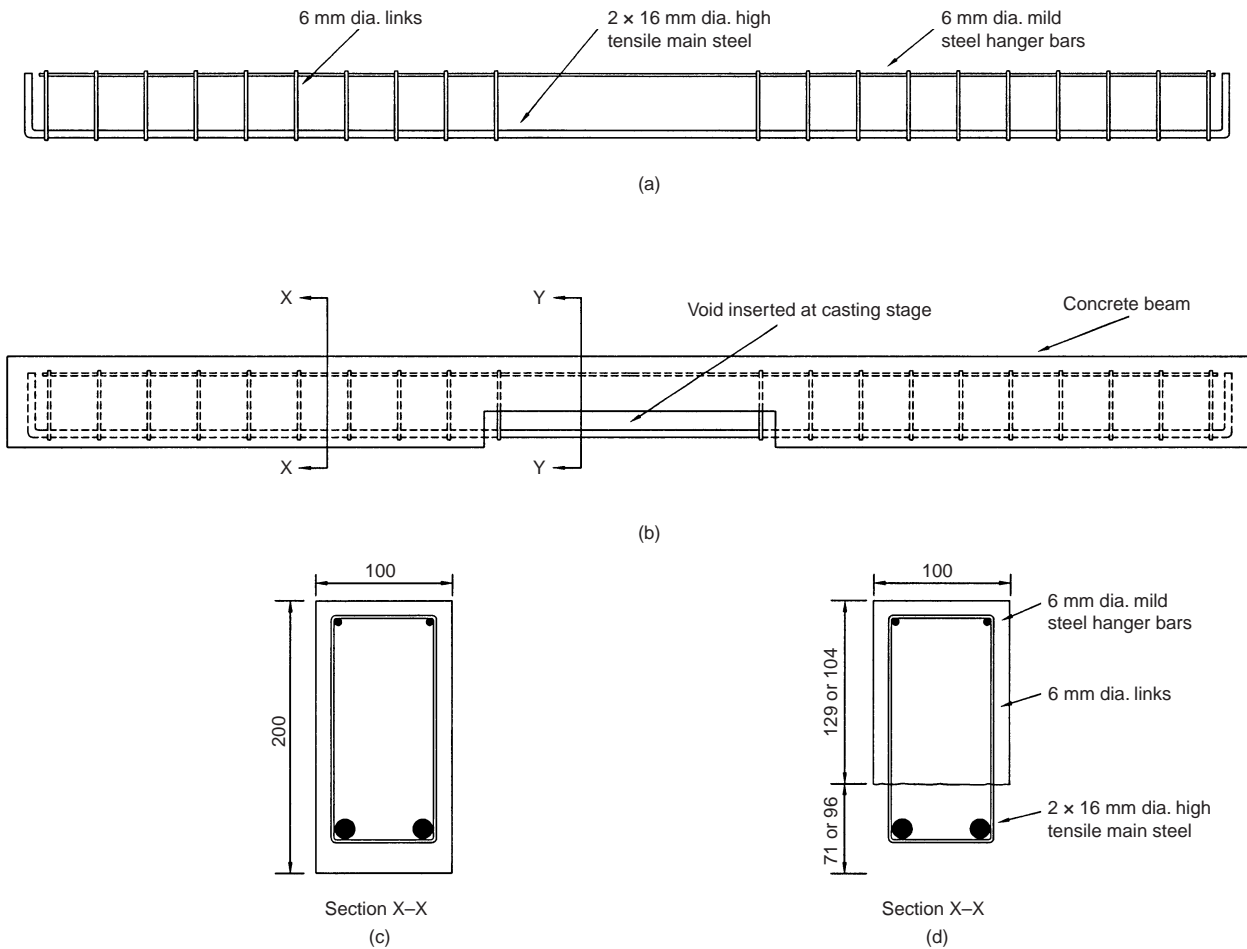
Reinforced concrete (RC) beams manufactured in the laboratory: (a) steel reinforcement details; (b) RC beam with repair void; (c) cross-section of beam; and (d) cross-section through the repair void (all dimensions in mm)
